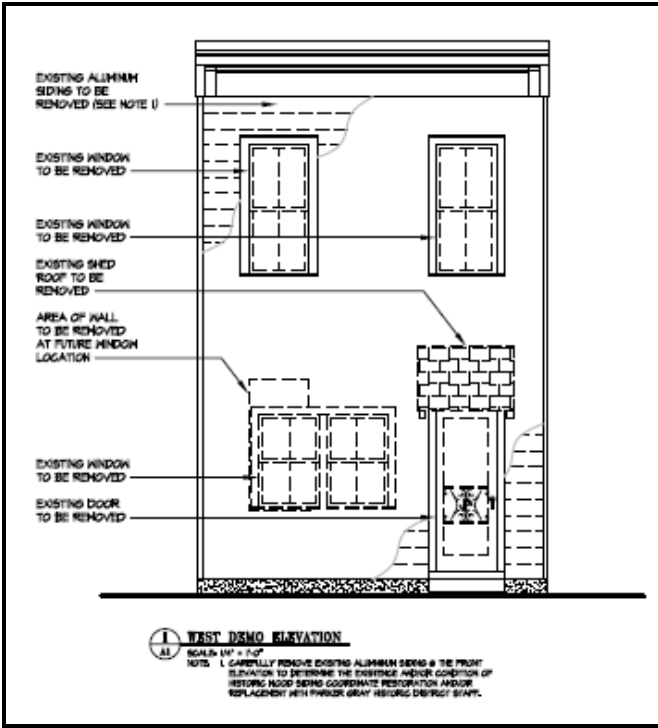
Existing front facade showing areas of encapsulation/demolition.
